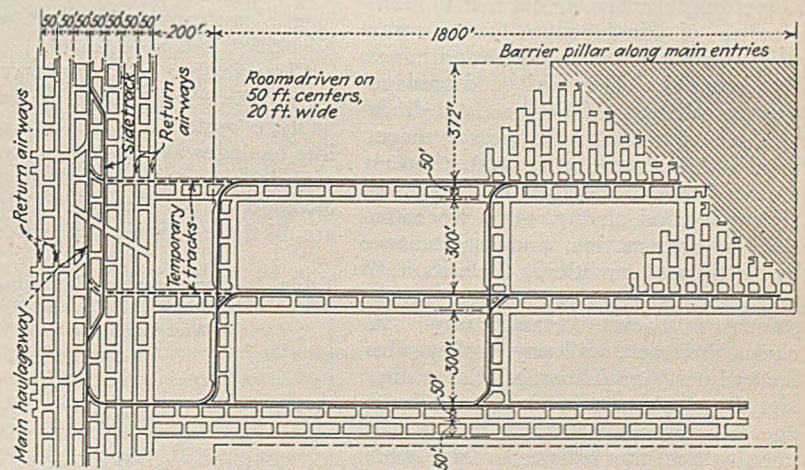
Mining Plan in the Pocahontas Division, Showing Location of Sidetracks With Reference to Working Sections
